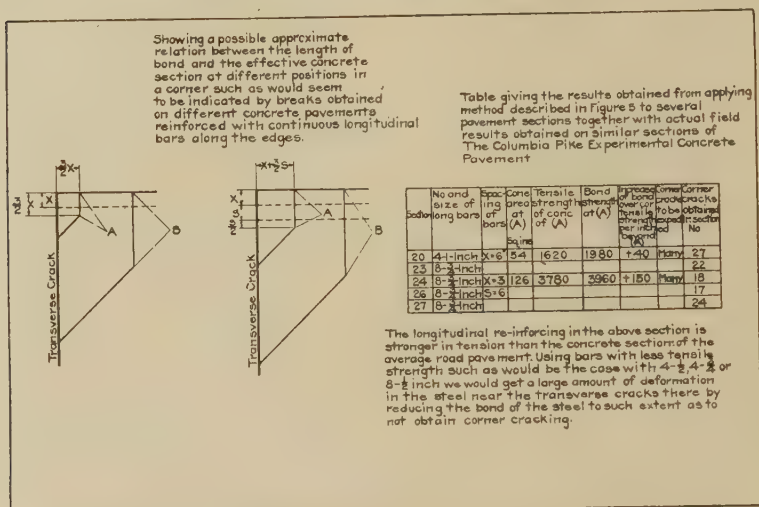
THEORY OF CORNER BREAKS DUE TO STEEL REINFORCEMENT.
